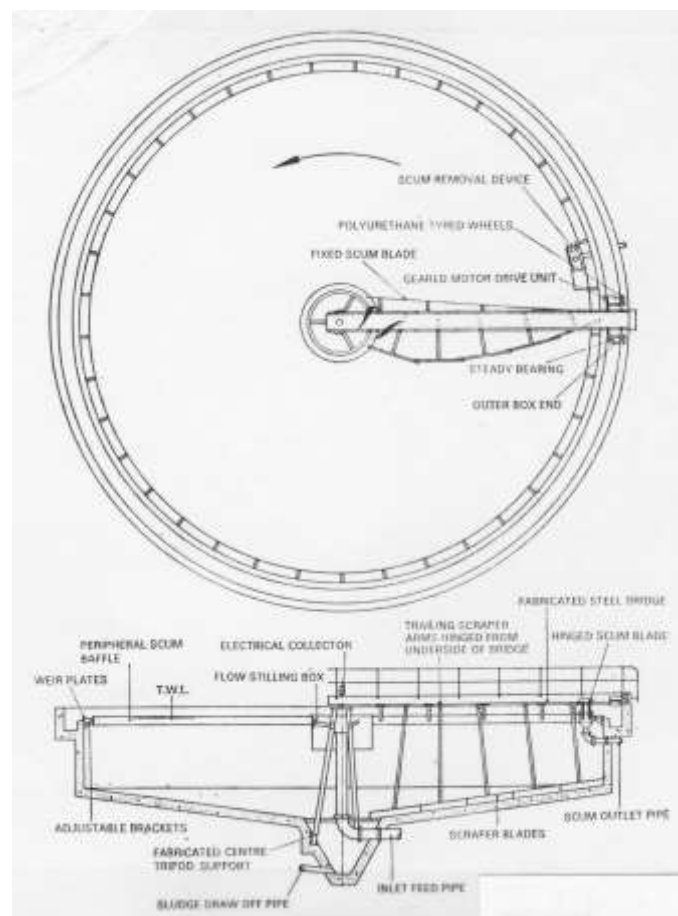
SCRAPER BLADES IN CONTINUOUS VOLUTE LAYOUT.
